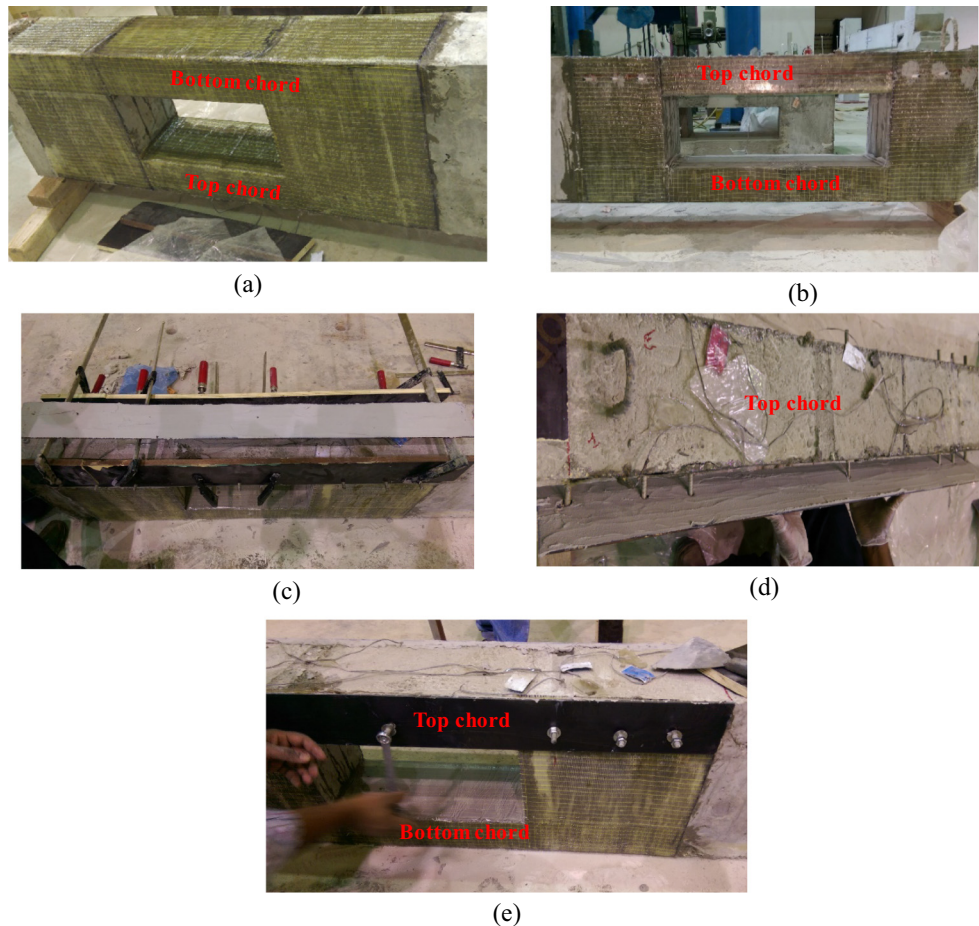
Steps involved in strengthening of beams using scheme-2: (a) GFRP-strengthened beam; (b) Holes drilled and threaded rods passed; (c) Sika-41 epoxy applied to steel plates; (d) Steel plates passed through the rods; (e) Nuts being tightened.
